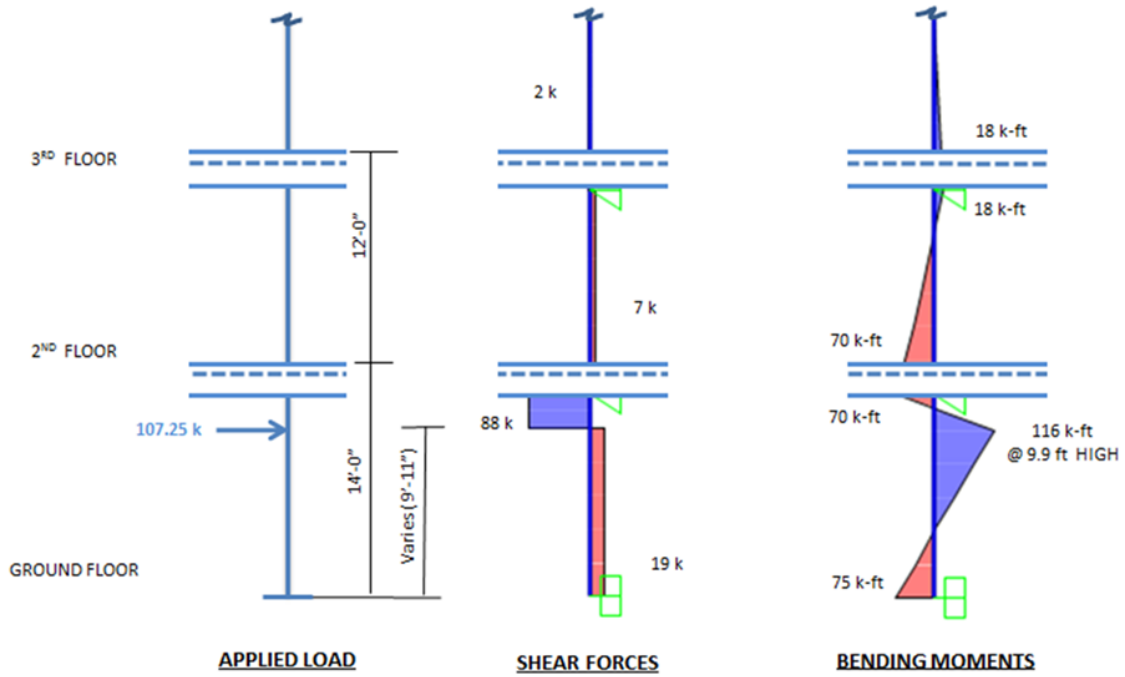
Impact load applied at "d" away from the end of column on the ground floor
